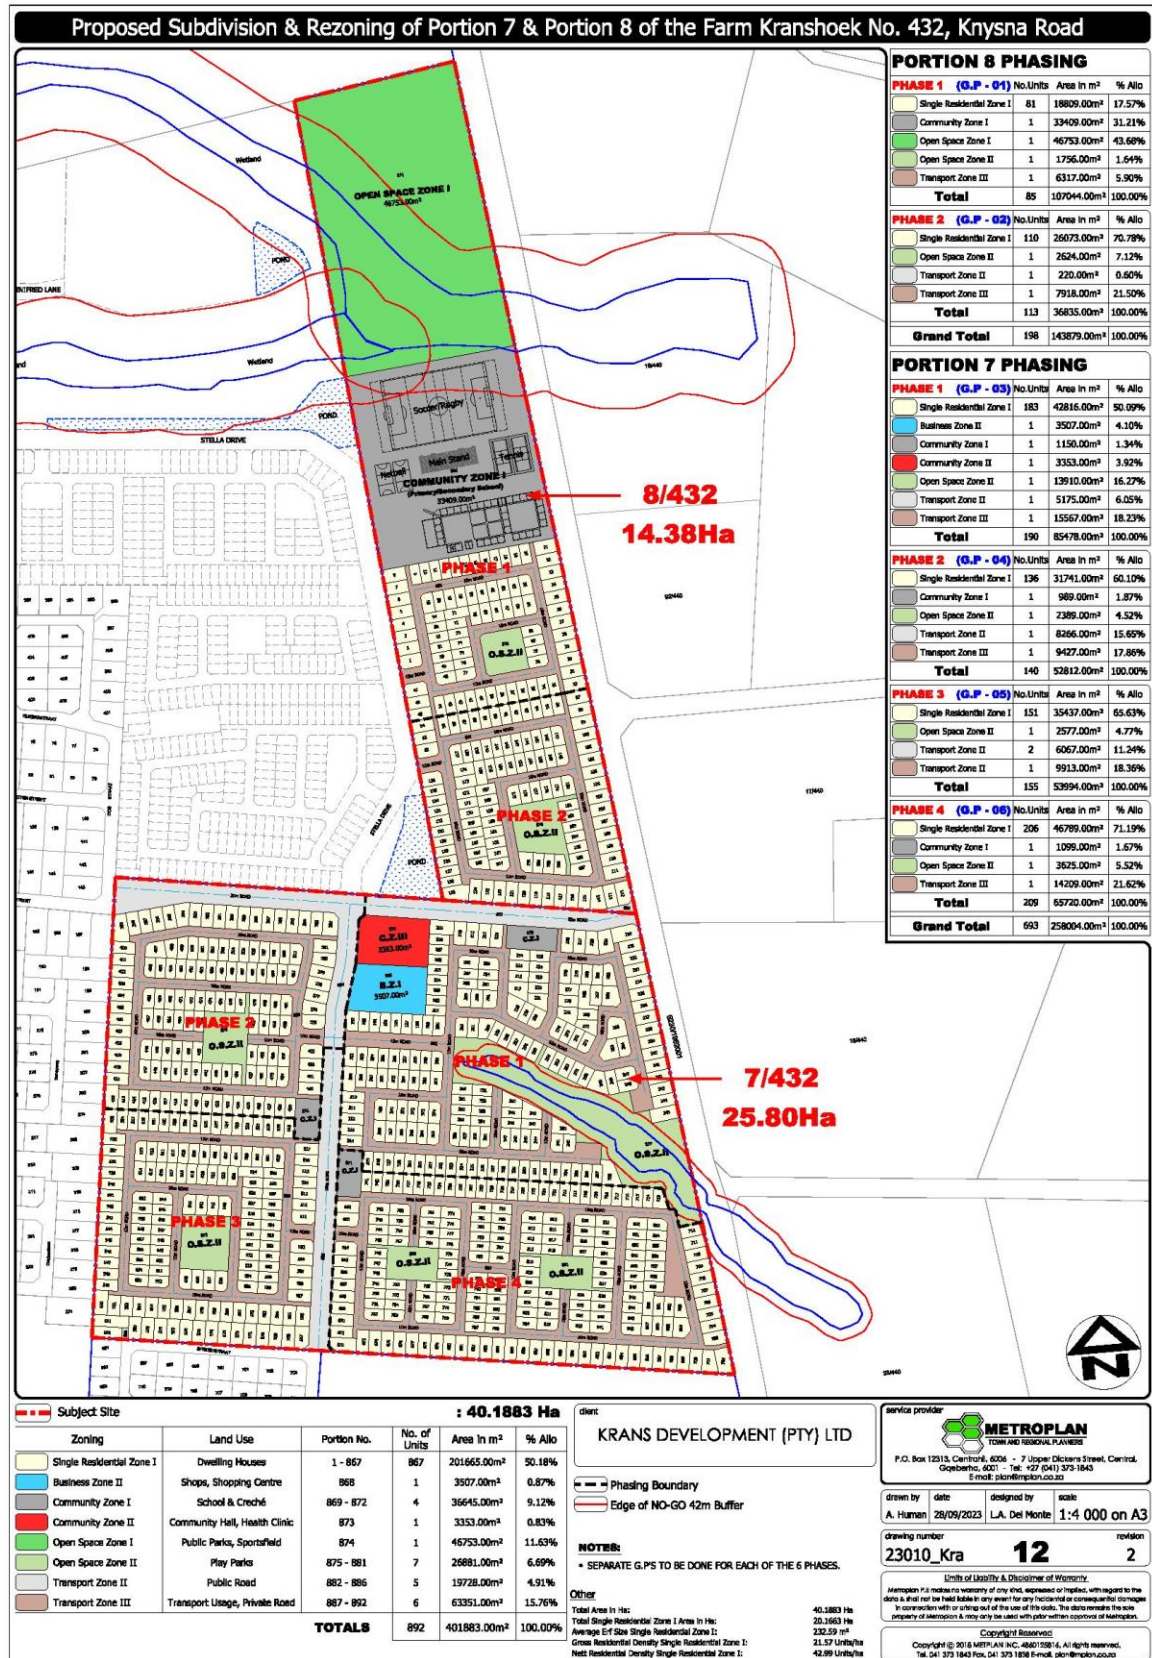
Alternative A layout for the proposed development (by MetroPlan, dated 28/09/2023)
